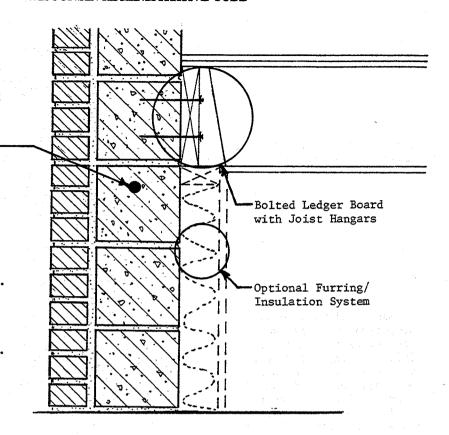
Multi-Wythe Masonry Wall (Bearing Condition)
